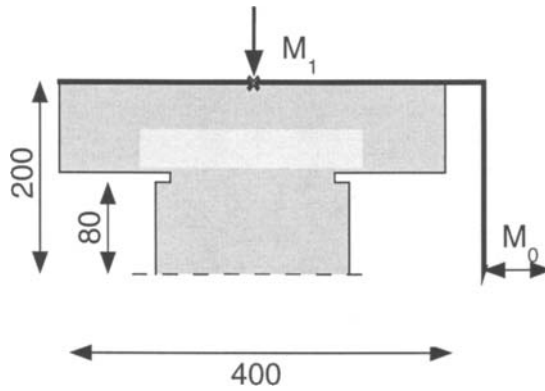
Compression shear test: specimens tested (dimensions in mm).
